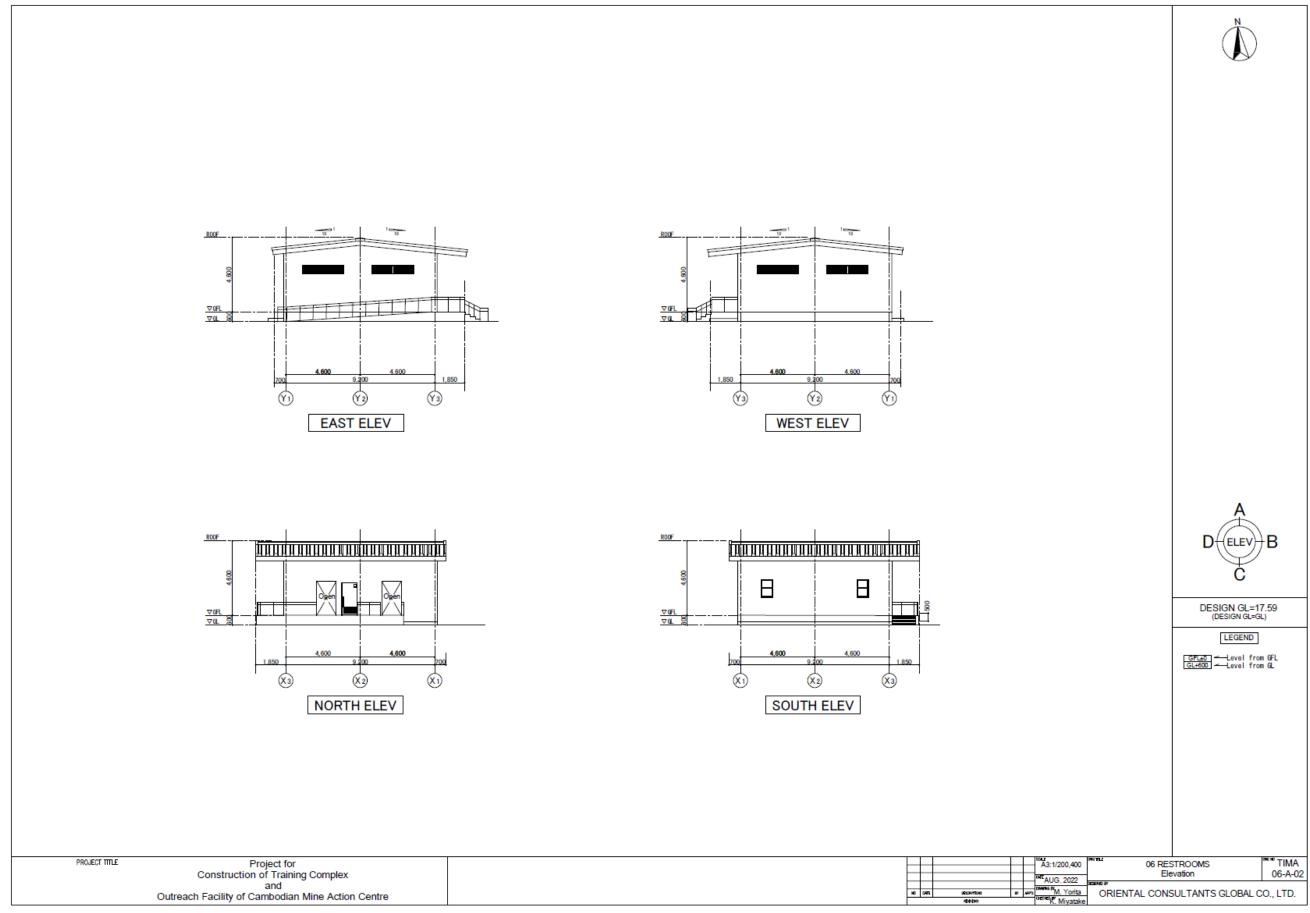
Elevation of TIMA Restrooms for Classrooms
